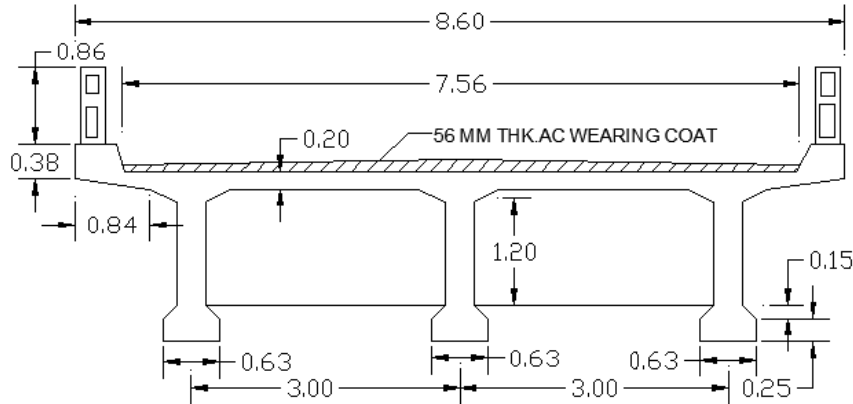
Cross section of T-beam Bridge (All dimensions are in m)
